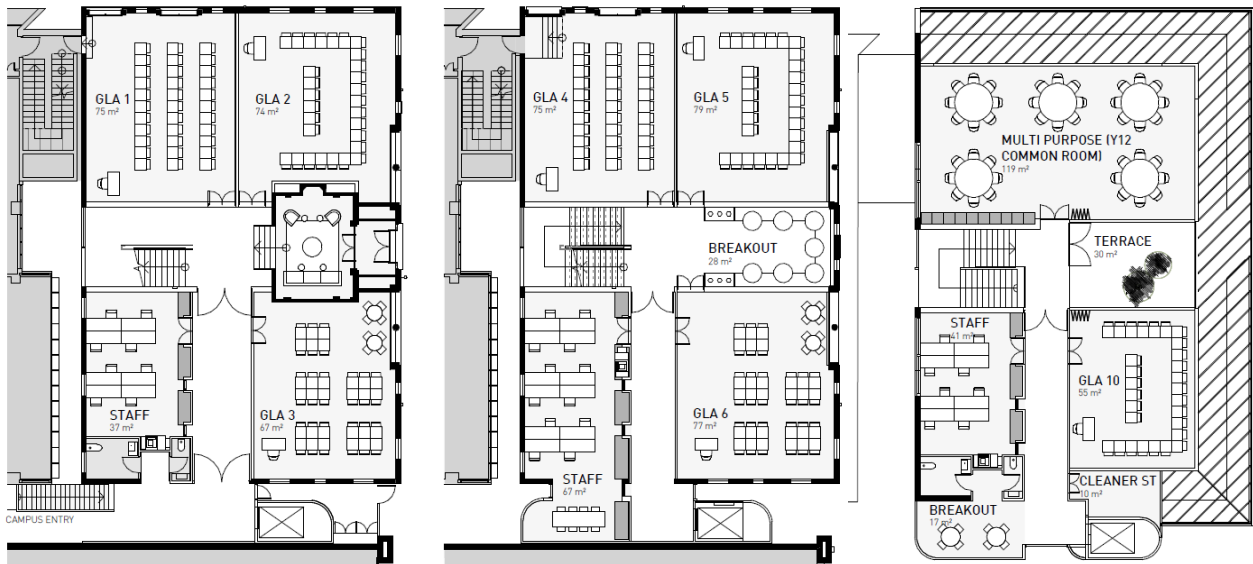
Proposed concept floor plans (ground, Level 1 and 3)
